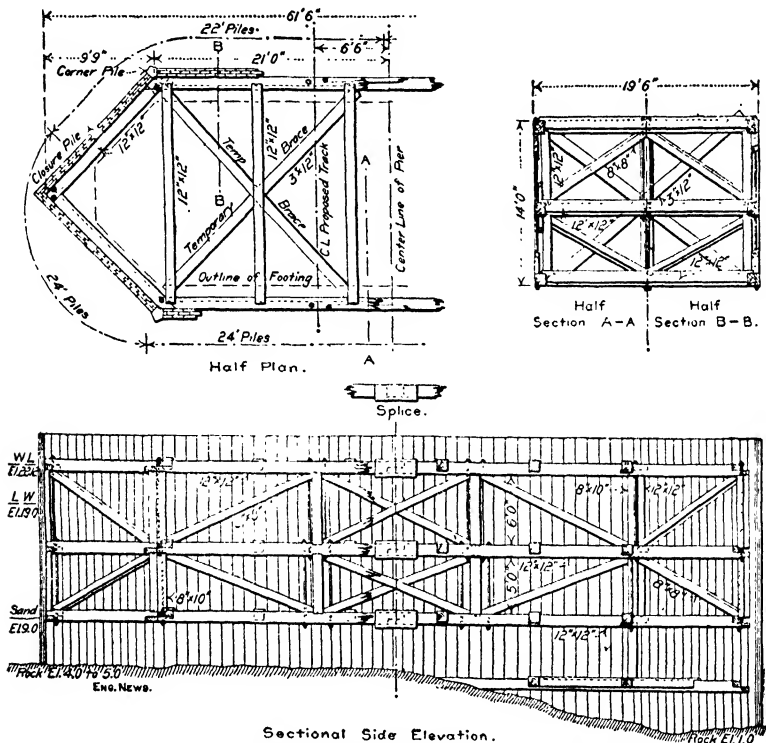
Cofferdam for Pier of Chicago, Milwaukee, and St. Paul Railway, Kilbourn, Wis.
